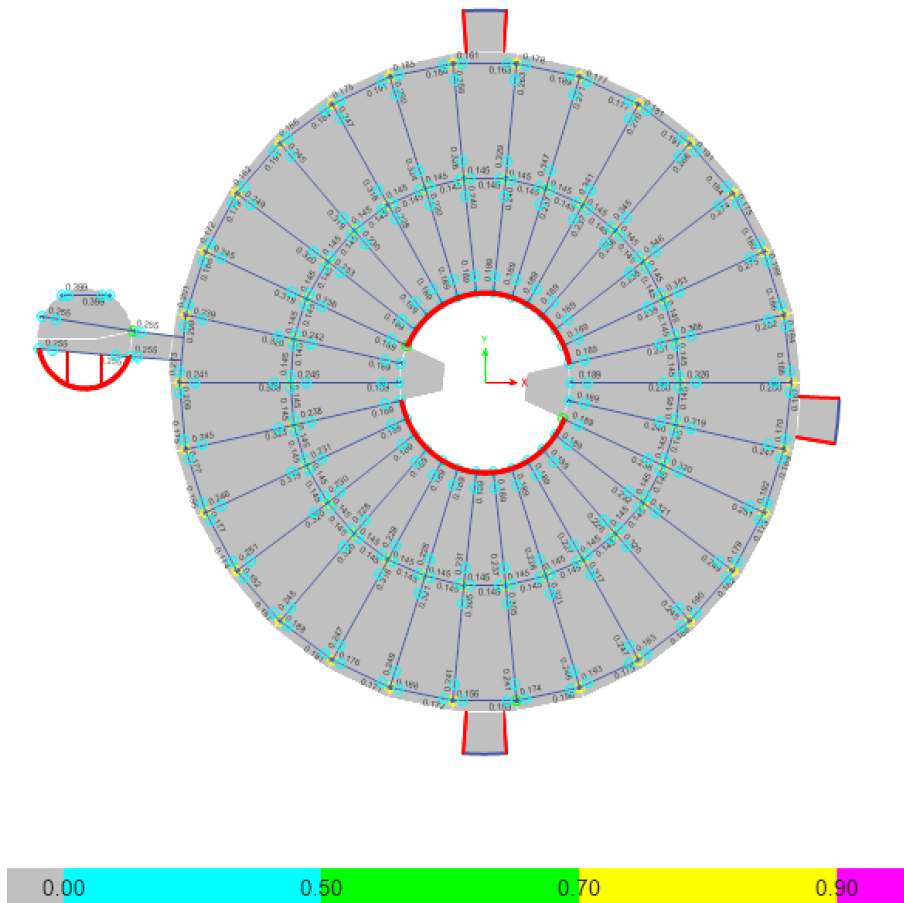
Plan View of Structure with Steel Connections Passing Testing
